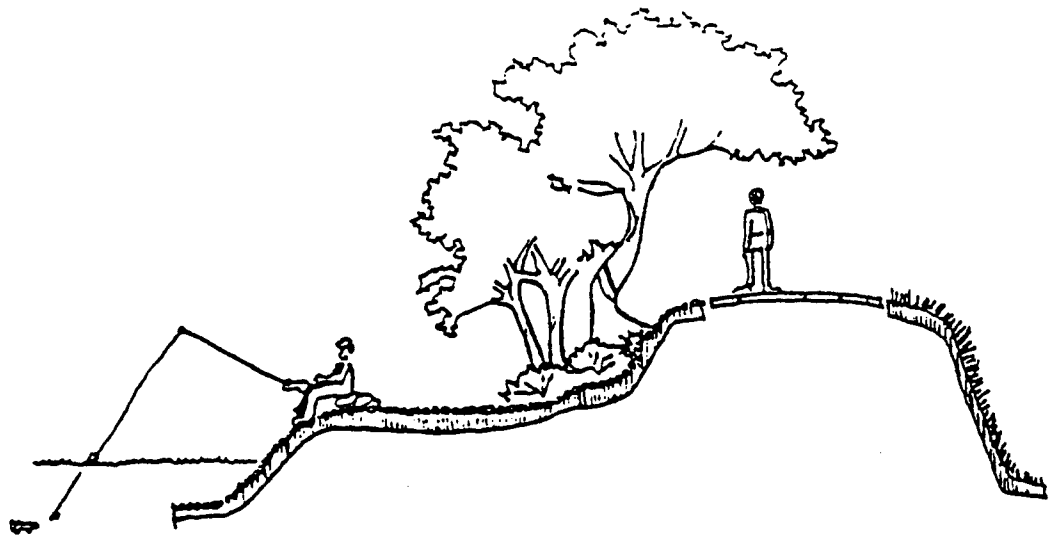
Cross-section of pedestrian /bike trail and walk-in fishing access.
